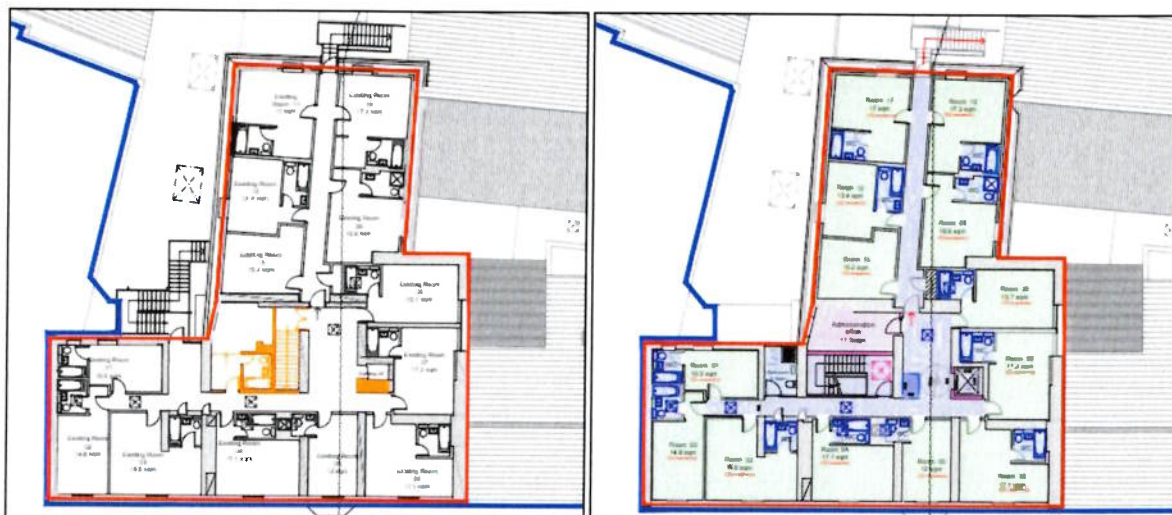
Existing (left) and proposed (right) third floor plan.
